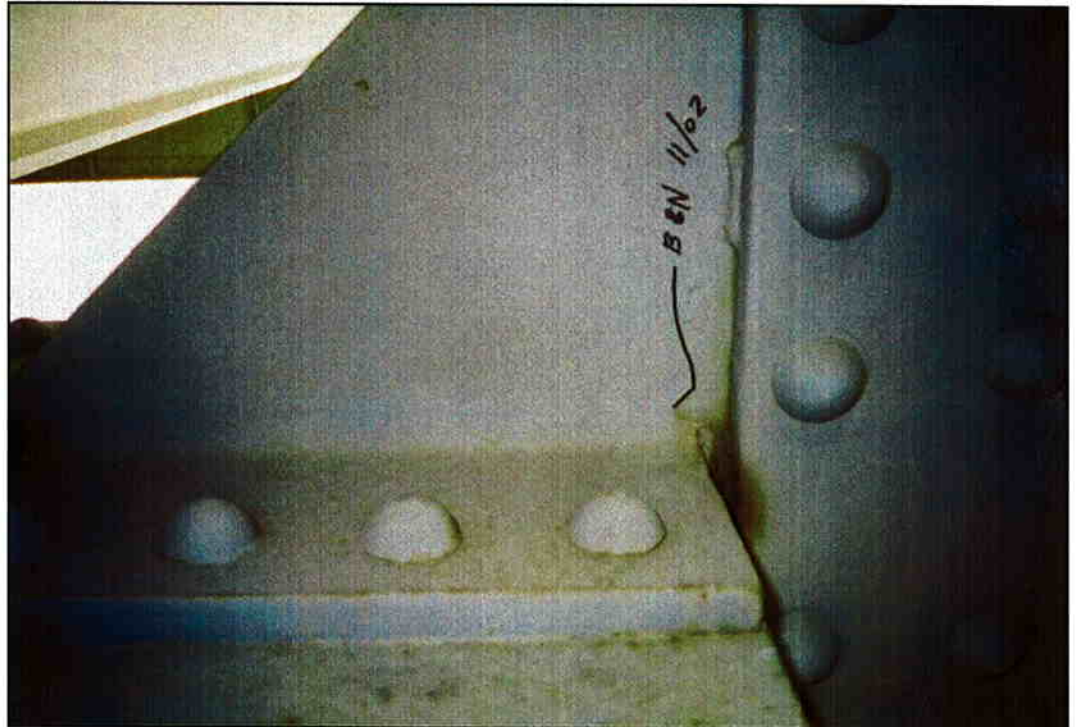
Looking south at angle tee at downstream floorbeam connection 4, lower deck. Note new 1/2 inch long crack in angle tee.
